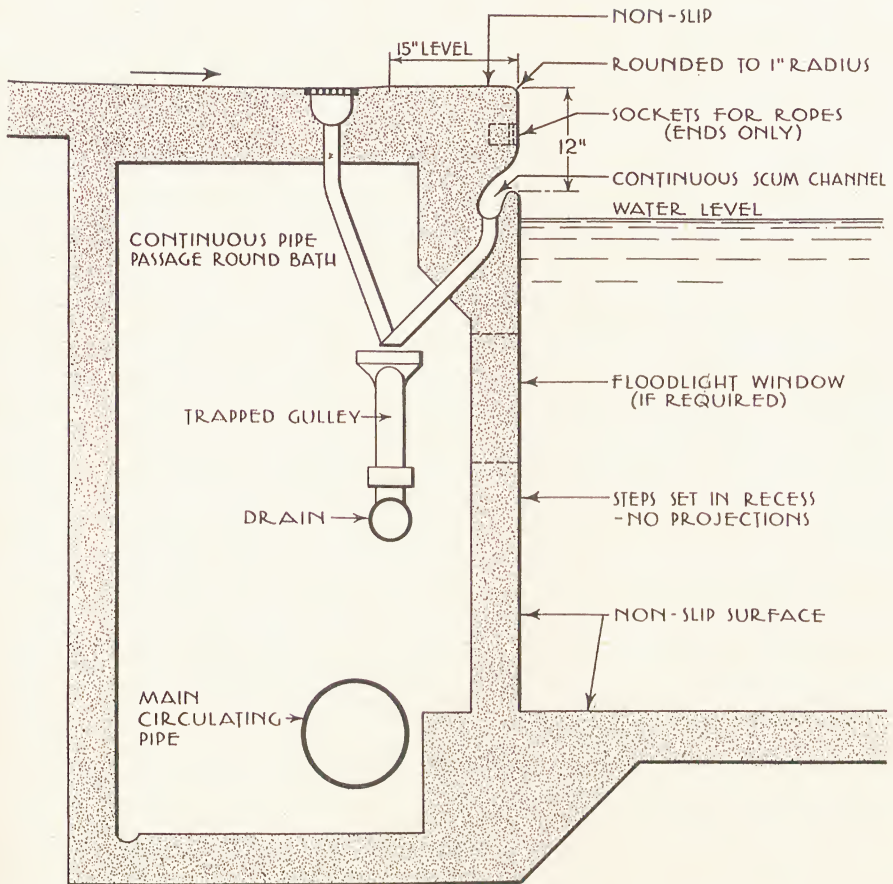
CORRECT DETAILS FOR BATH WALL
